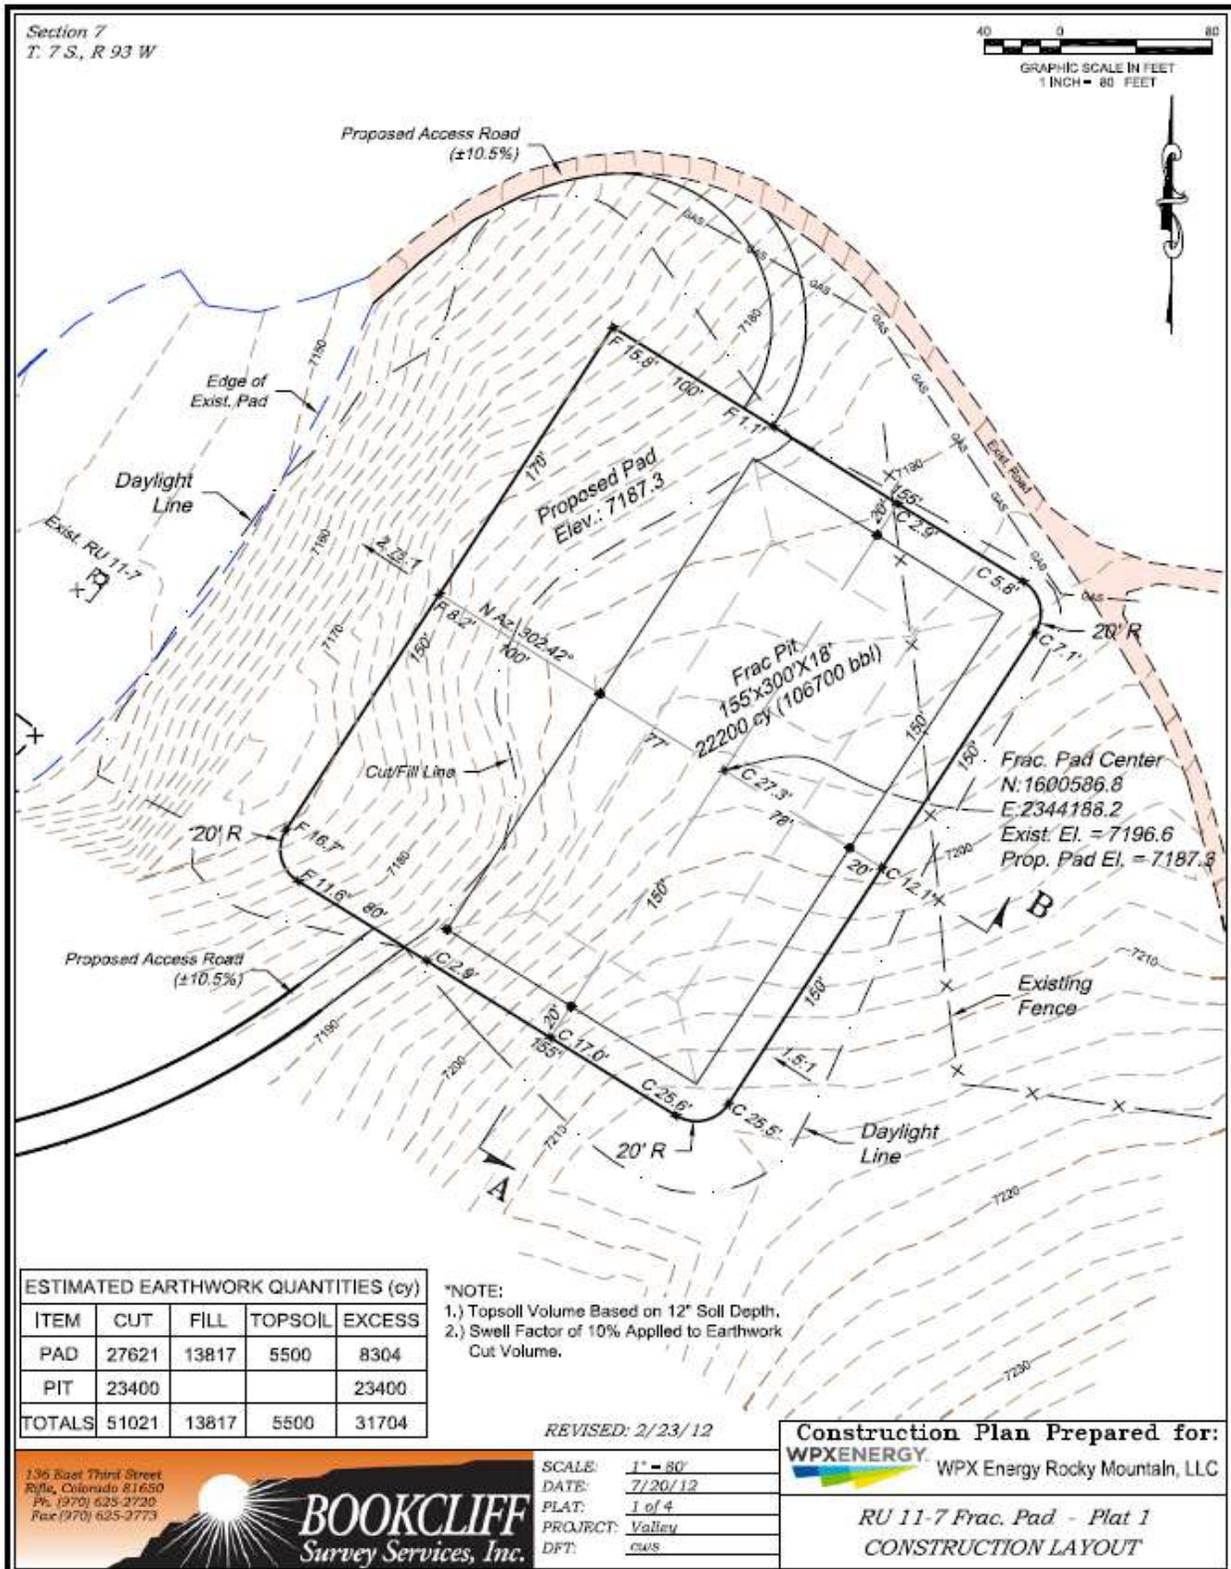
RU 11-7 Remote Frac Water Storage Facility
